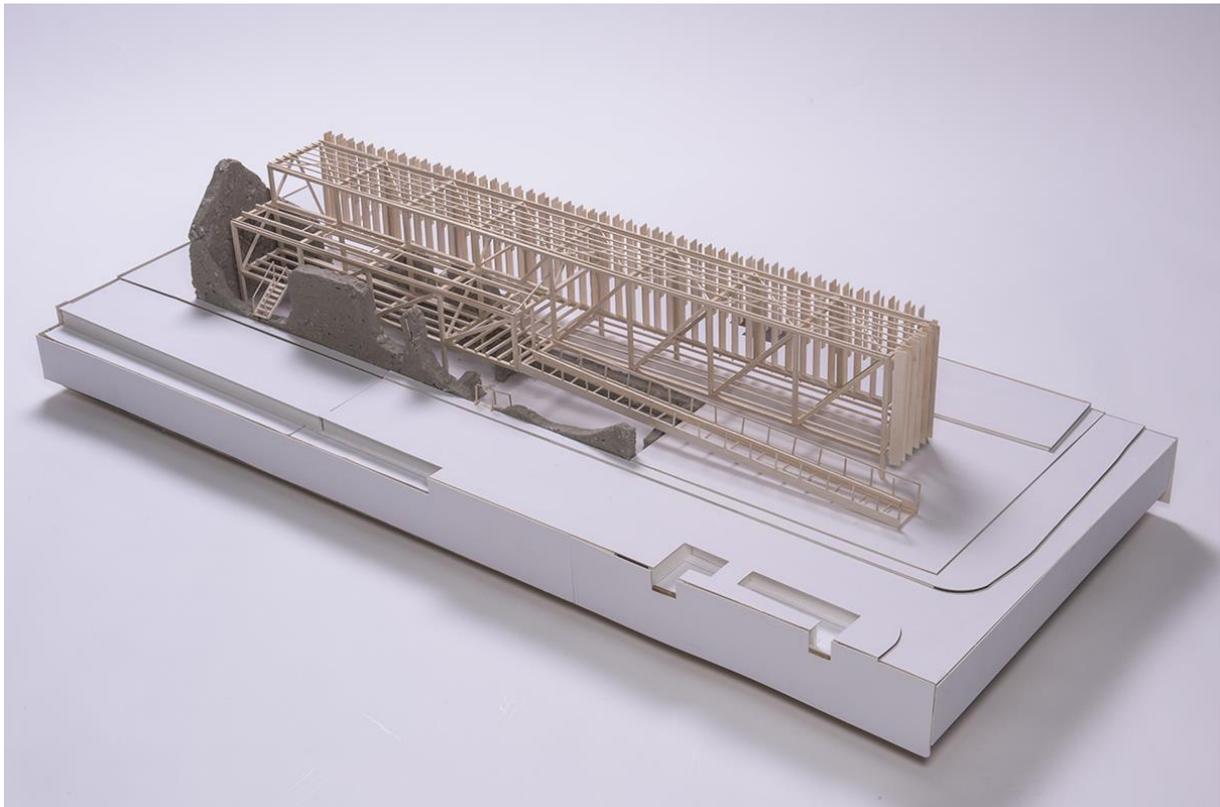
CENV6160 Scale model showing the site and the proposed structural framework.
